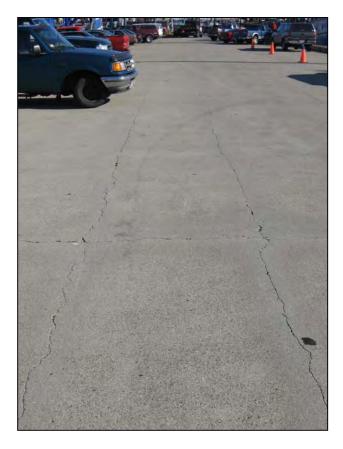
Typical longitudinal and transverse cracking observed along the deck of the original structure.
